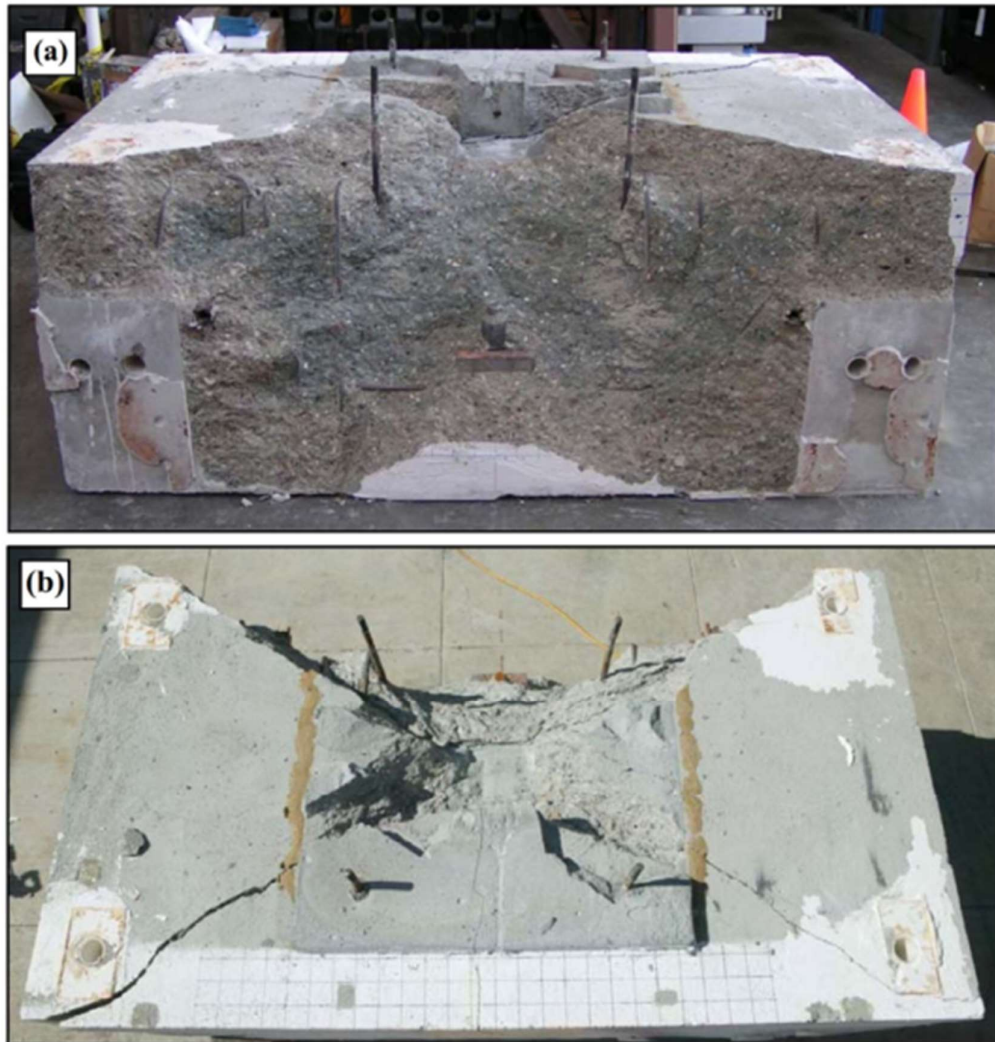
Shear key breakout failure of the concrete [after Gomez et al. (2009)]
